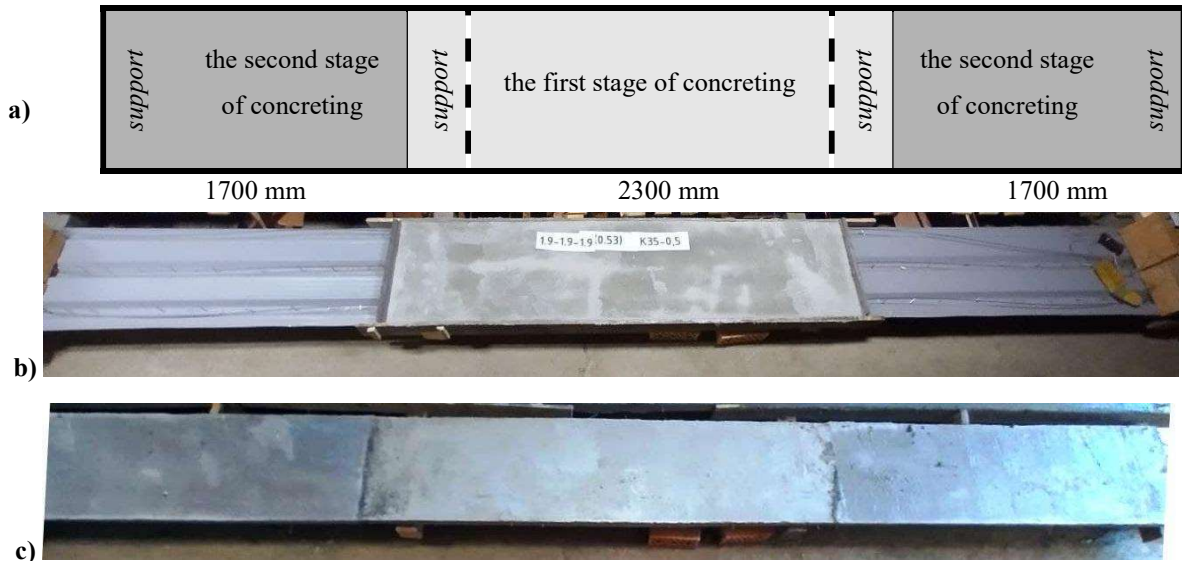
First experimental sample of steel reinforced concrete three-span continuous slab on a non-removable formwork from a profiled steel sheeting:
